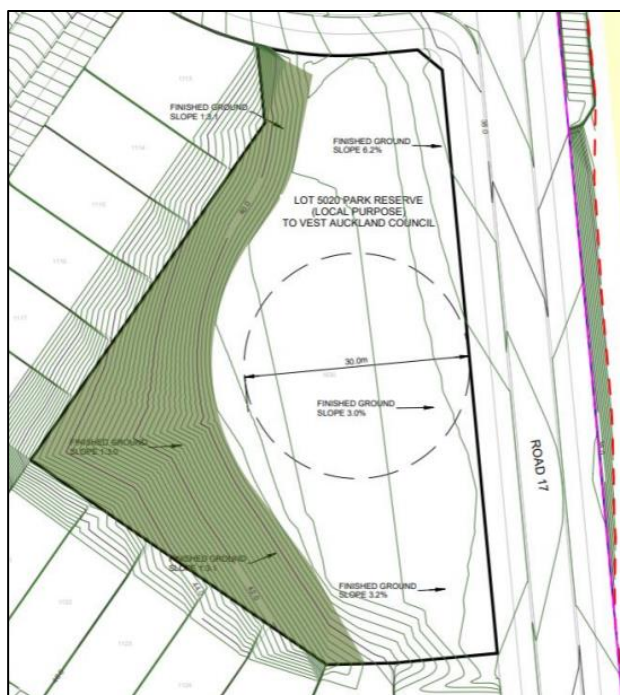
Stage 2 Neighbourhood Park Scheme plan.
